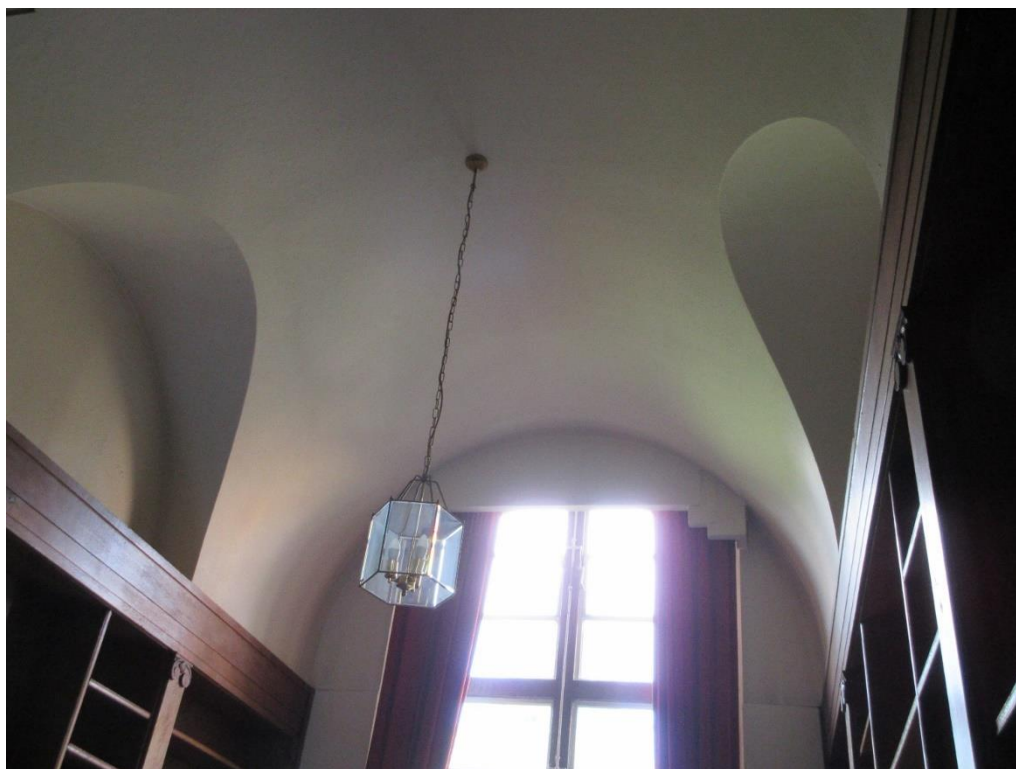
Ground floor of extension A – Vaulted ceiling on one of the rooms.
